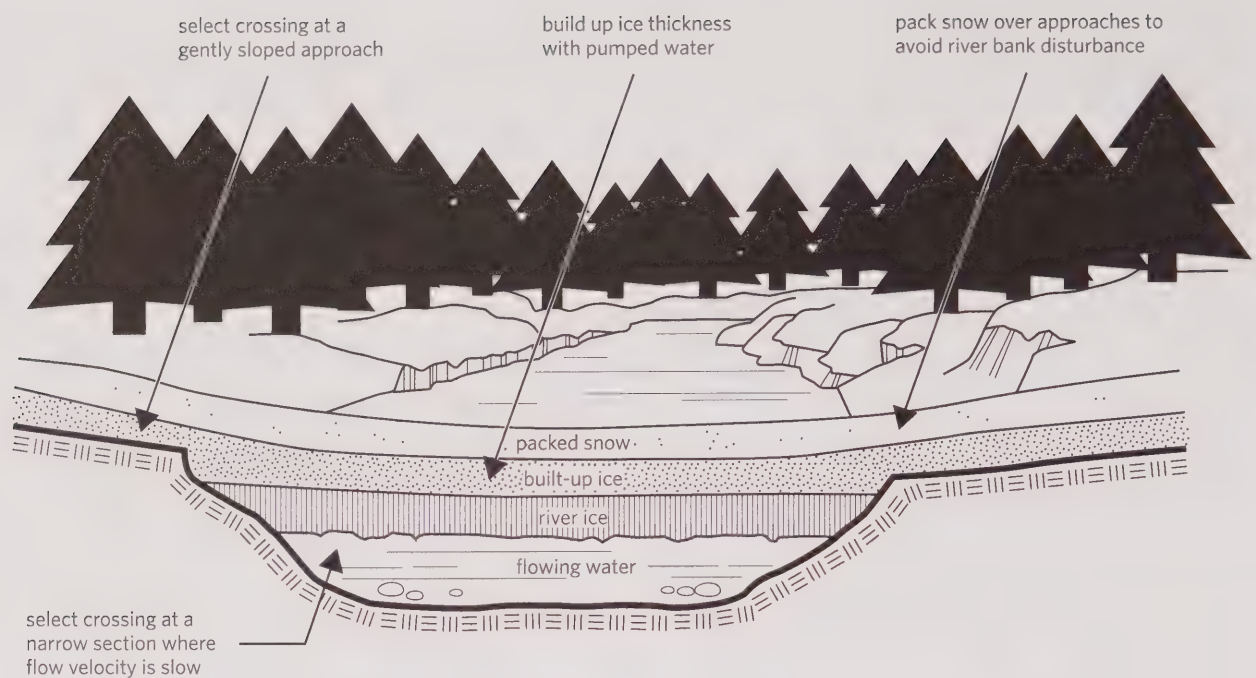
Typical ice bridge location and construction. (modified from Department of Transportation, Government of the Northwest Territories, 1993)
